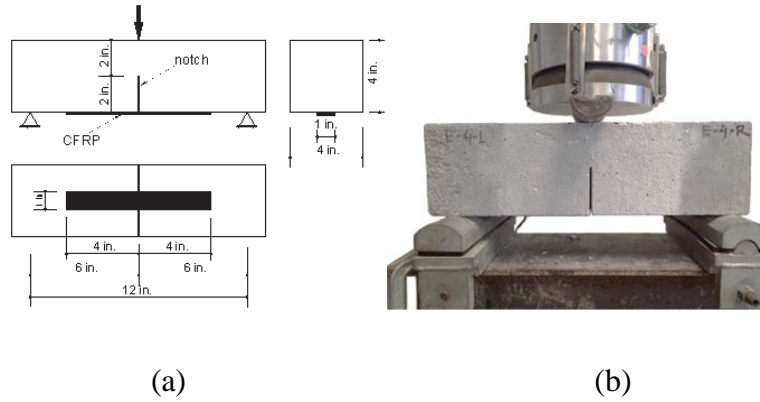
Three point bending test setup; (a) Small beam specimen specification; (b) Three-point bending test fixtures of notched beam specimens
